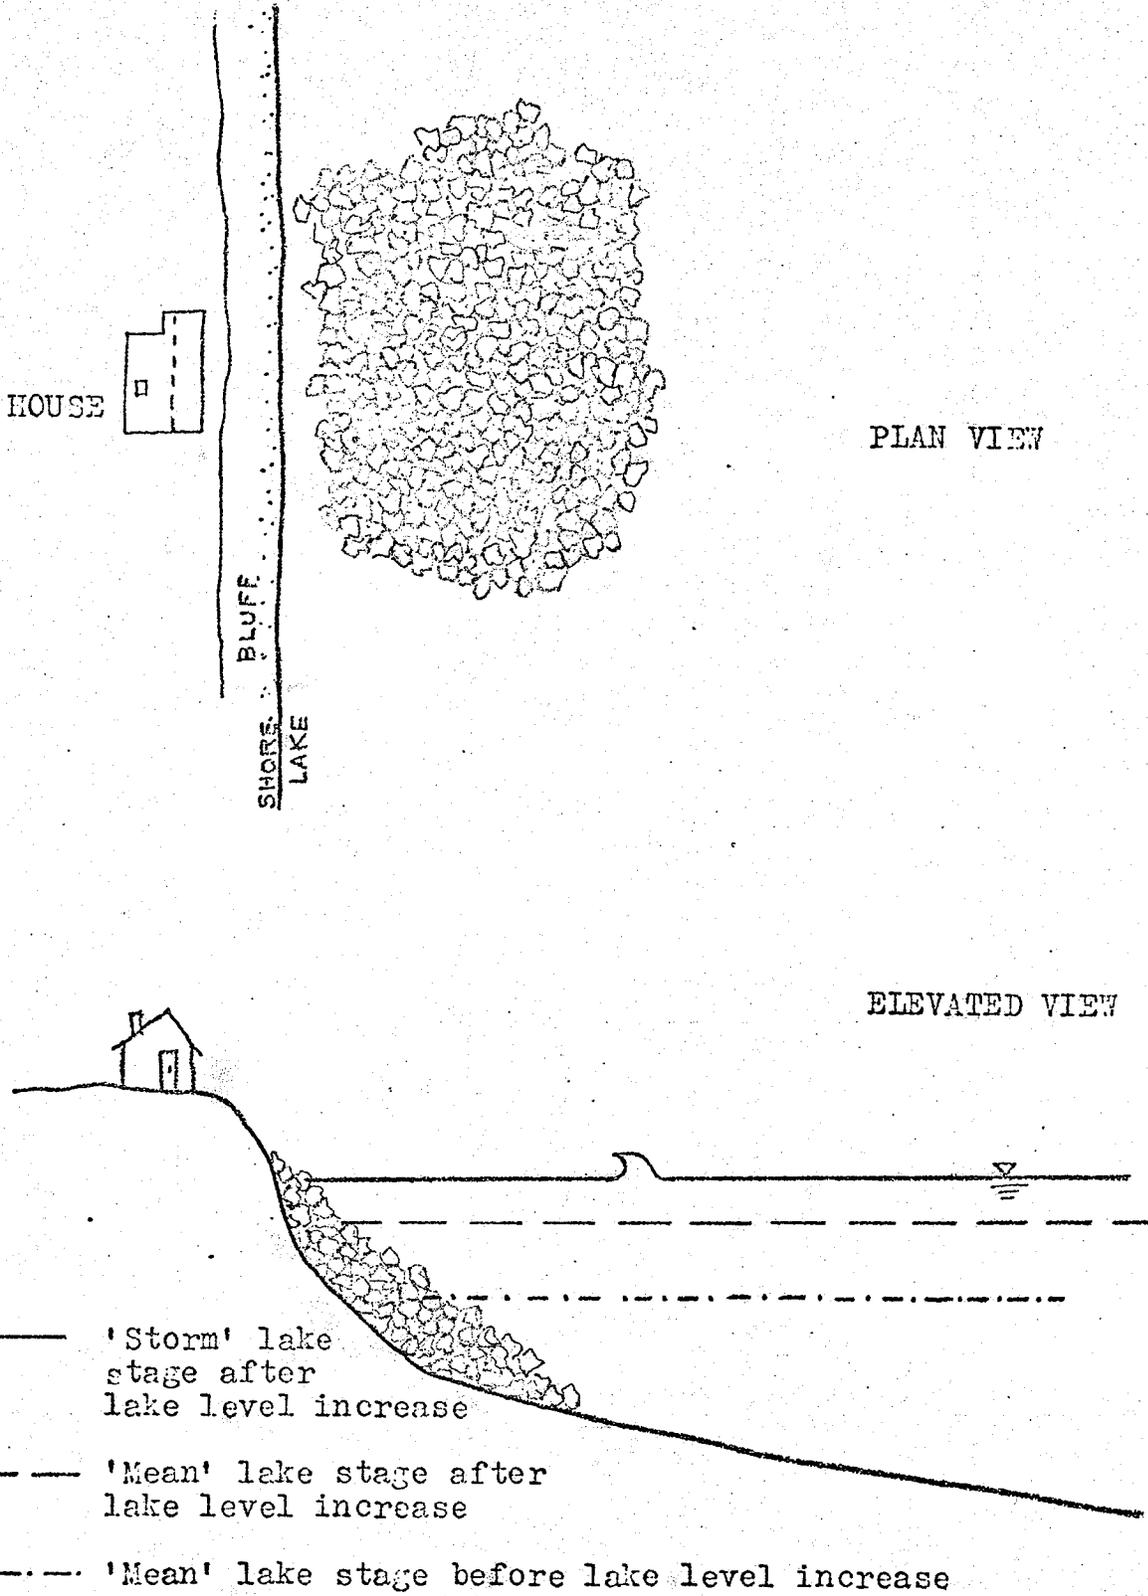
COMMON SHORE PROTECTION STRUCTURE.
